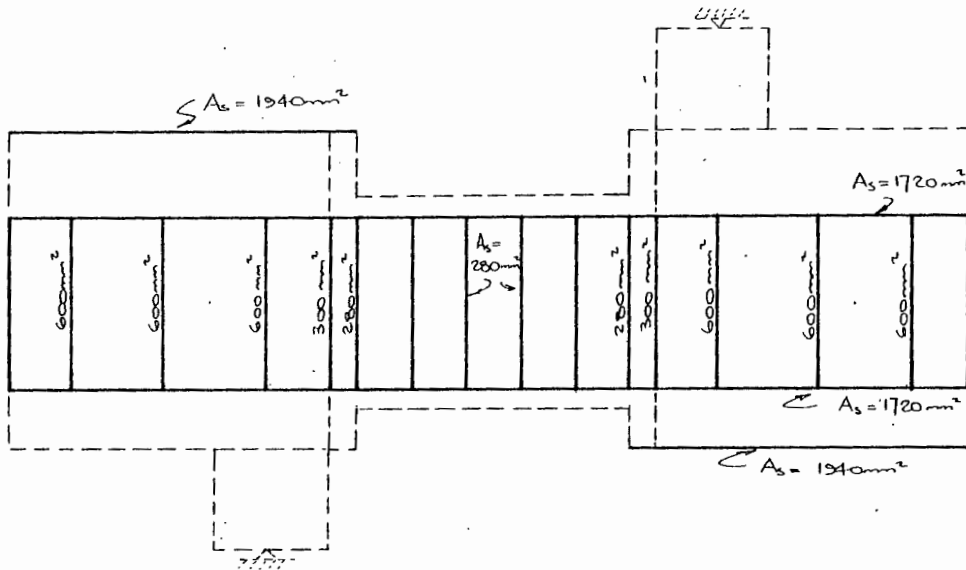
(b) : Coupling Beam 311: Reinforcement Layout corresponding to Finite Element Models 1 and 2
